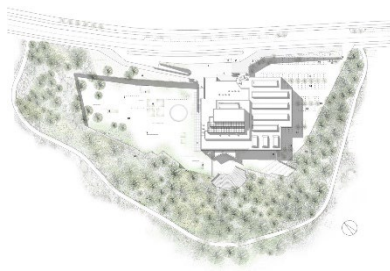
Roof plan of the museum (ARKITEKTEN, 2016)
